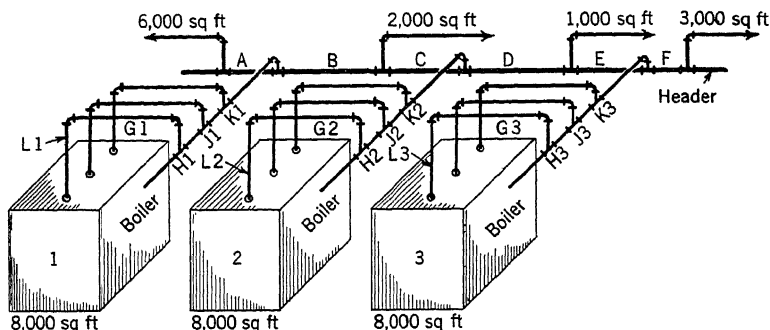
BOILER STEAM HEADER AND CONNECTIONS
